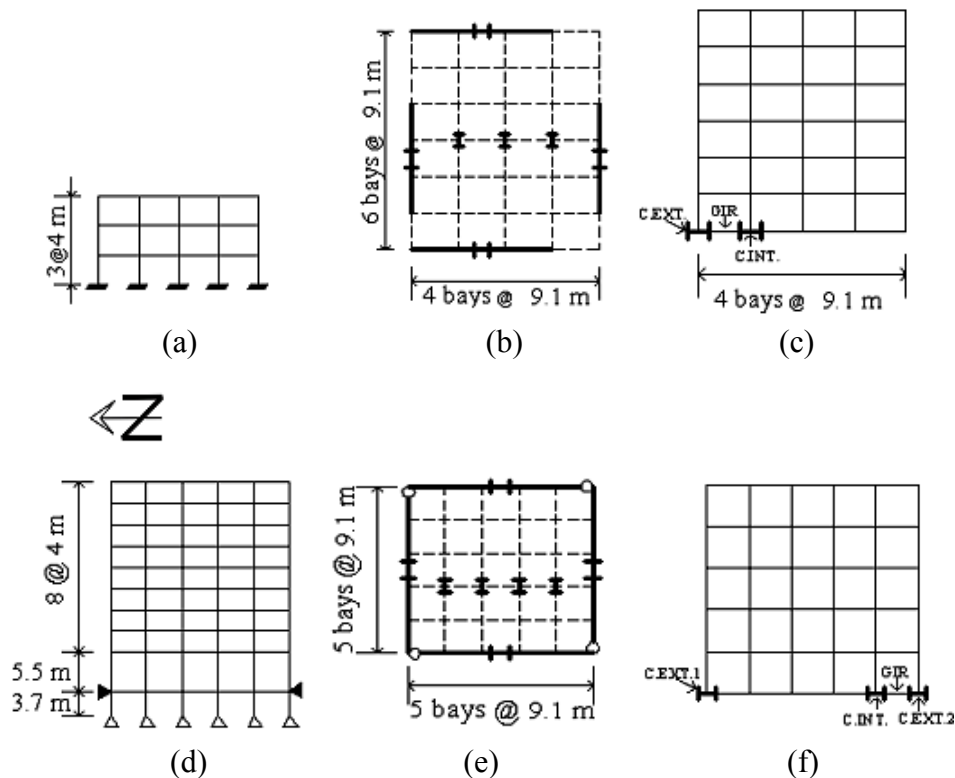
Elevation, plan and element location for Models 1 and 2: (a) elevation of Model 1, (b) plan of Model 1, (c) studied elements of Model 1, (d) elevation of Model 2, (e) plan of Model 2, (f) studied elements of Model 2
